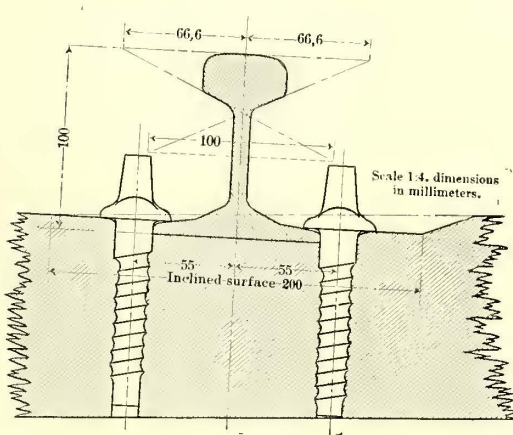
TYPICAL FRENCH T-RAIL SECTION
